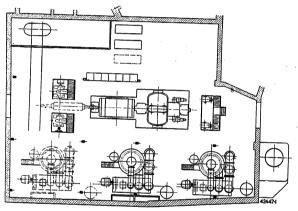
Haifa Steam Power Station of the Palestine Electric Corp. Velox steam generator for 34,500 kg/h of steam, 27 kg/cm² abs, 450° C with charging set composed of a gas turbine, charging blower and auxiliary motor. The steam generator and the steam turbines are located in the same hall.
